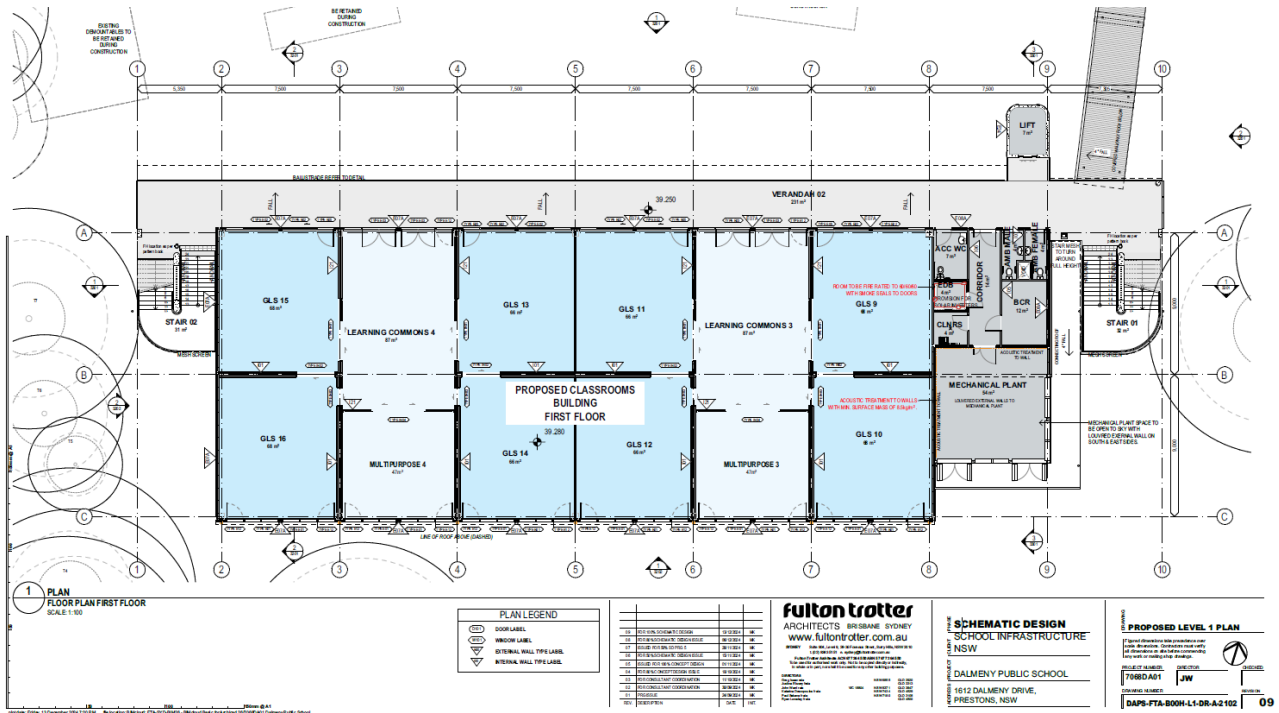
First Floor Level Plan. Source: Fulton Trotter Architects
